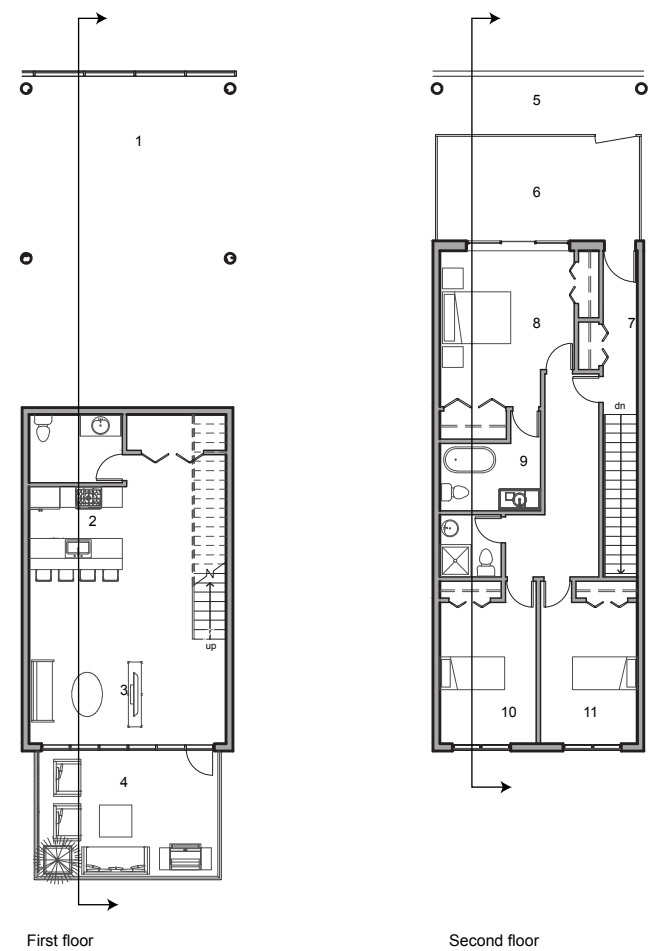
Maisonette with commercial on grade floor plans scale
